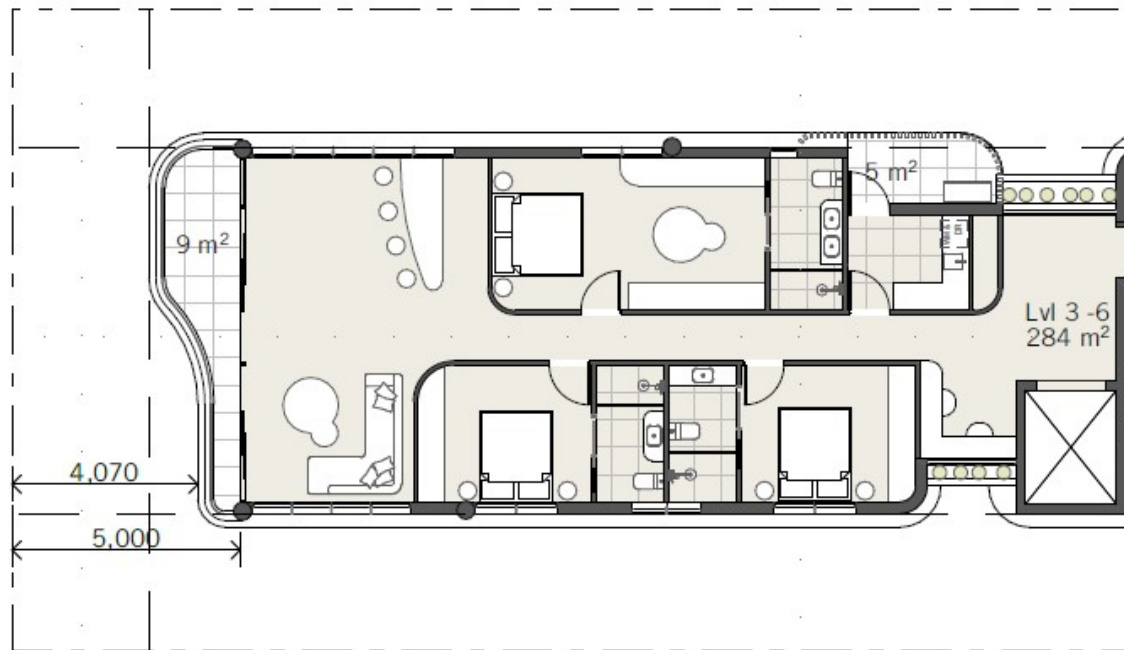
Partial level 3 – 6 floor plan (Source: Lightwave Architecture)
